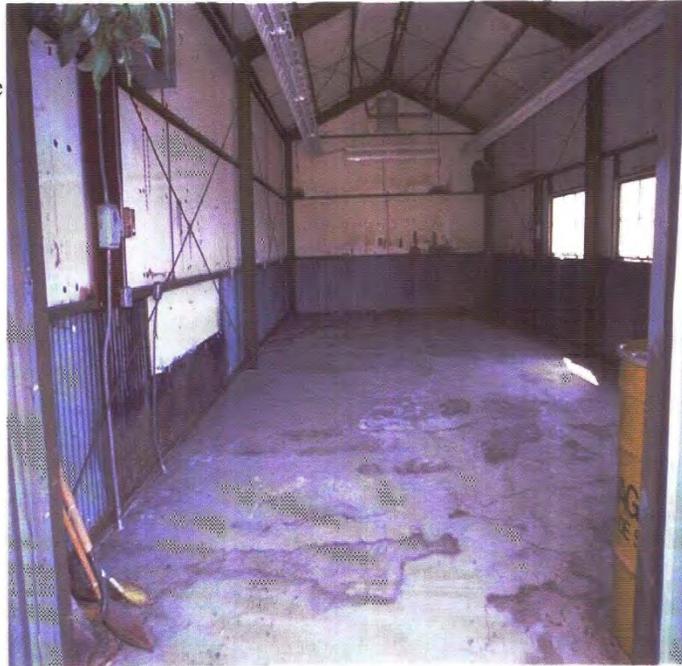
(Right): View inside Building T029, looking East. Size of building is 20 ft x 40 ft.
